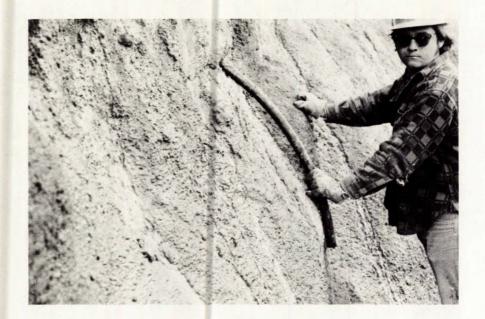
Provision must be made for draining shotcrete. Here a drainage tube has been wedged in a crack in the concrete face before spraying.
